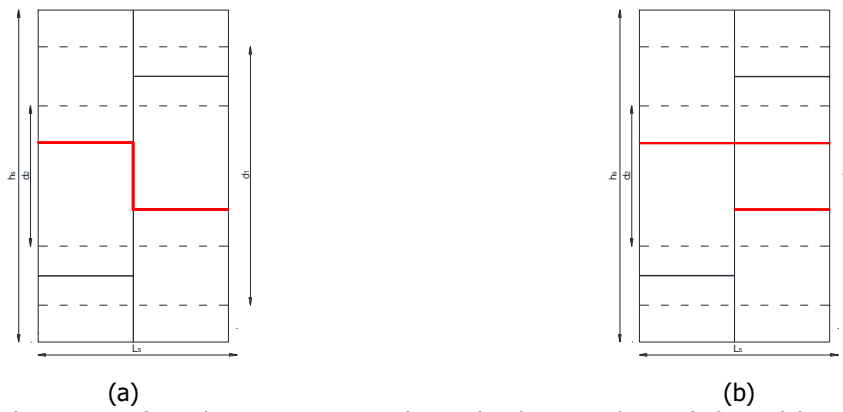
Crack patterns of CS element masonry subjected to horizontal out-of-plane: (a) stepwise crack; (b) stepwise crack and splitting of unit;
